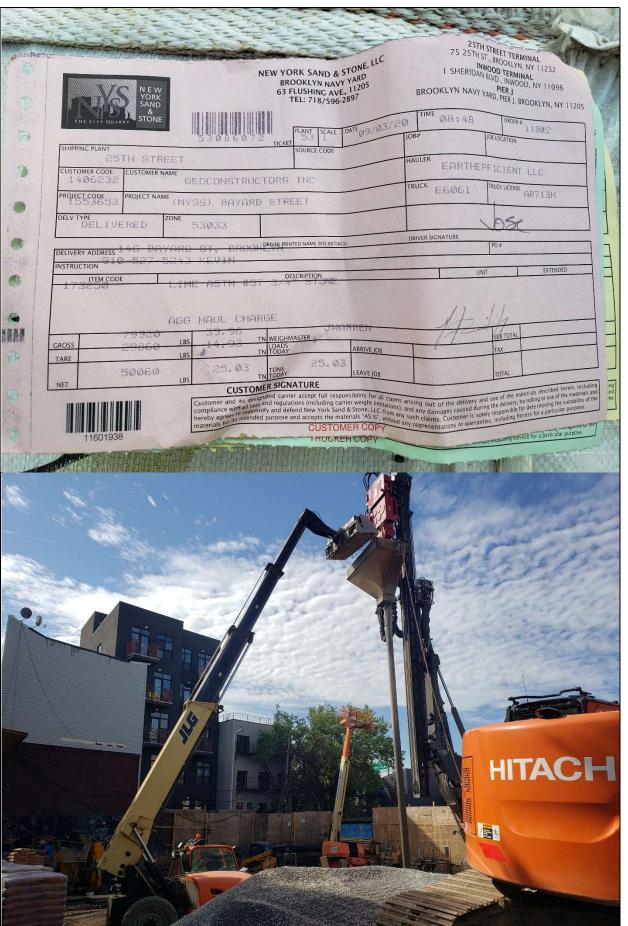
Loading gravel into hopper for grout mixture for soil improvement micropiles Photo 3 – View of drilling and grouting of micropiles in grid A2
